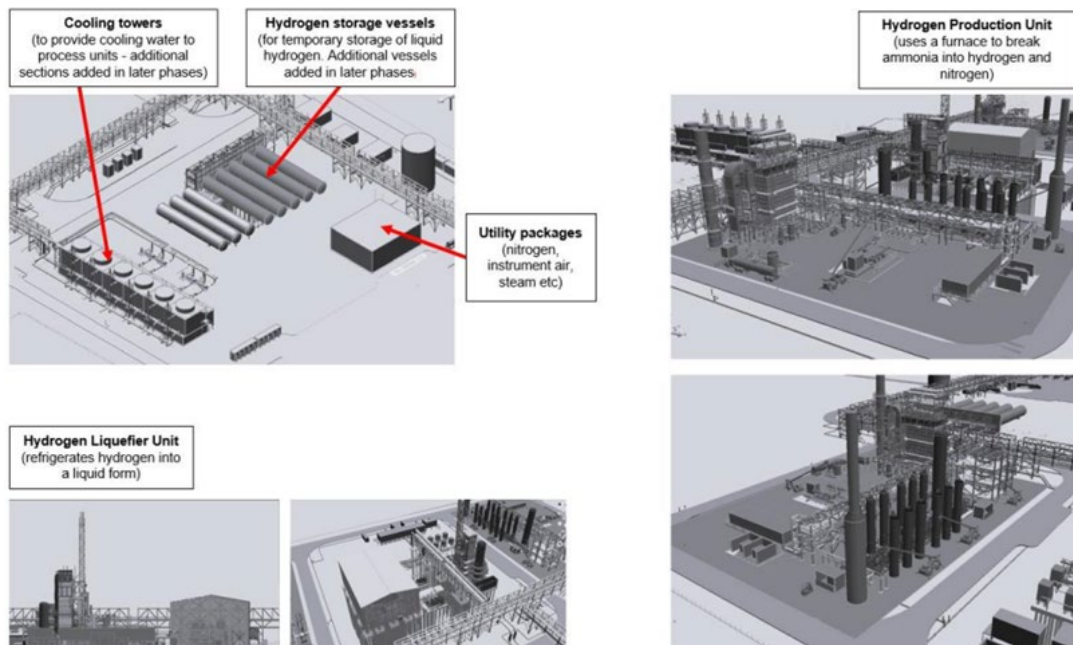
Typical structures on West Site (Work No.7) [Extract from Planning Statement APP-226]
